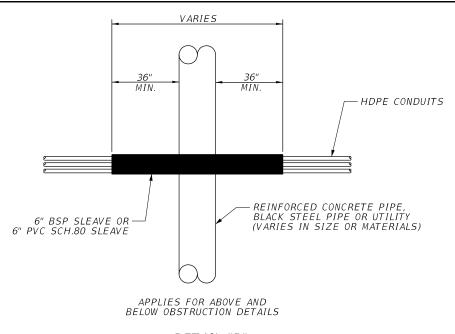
DETAIL "B" TYPICAL BSP OR PVC SLEEVE TRENCH DETAIL TO ABOVE CROSS OBSTRUCTION
